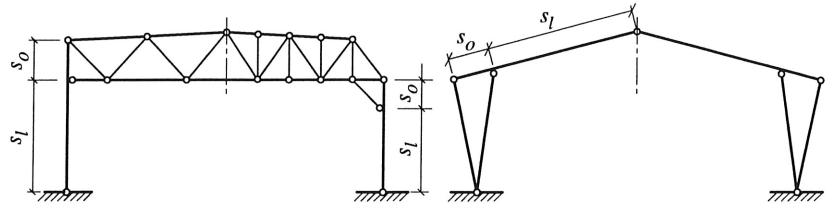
Portal frame (left) and three-hinged frame with V-shaped columns (right).
